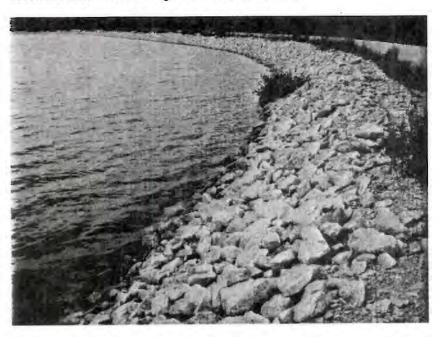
Photo of Embankment Inside Slope View – East end of ash pond looking northwest.
